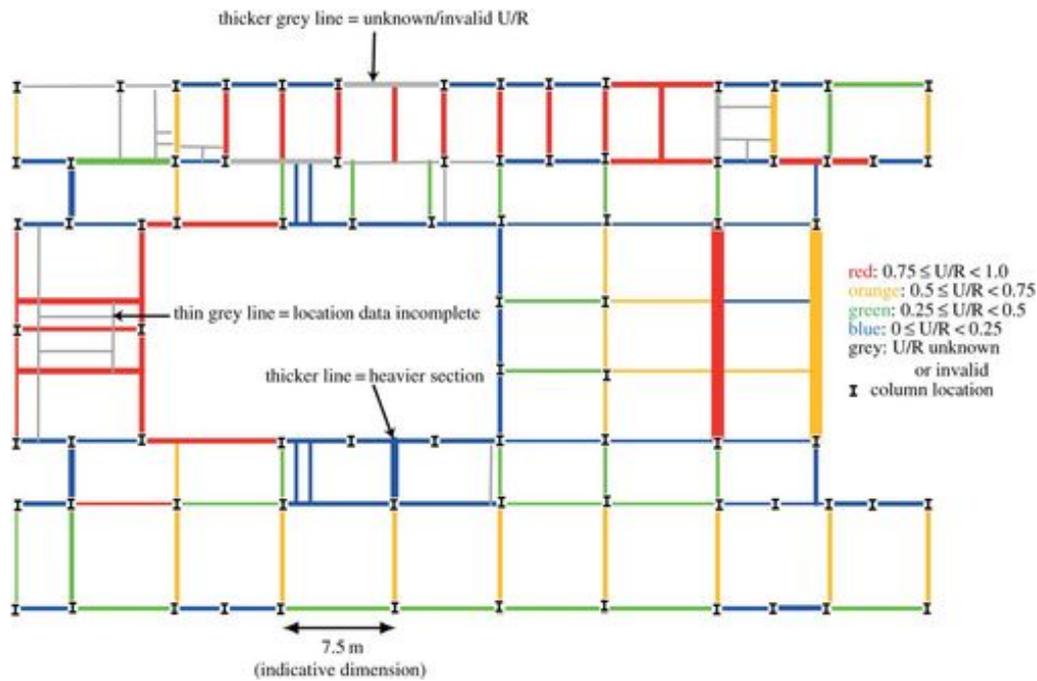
Example plot of floor showing U/R and section weight (Source: Moynihan and Allwood, 2014).
